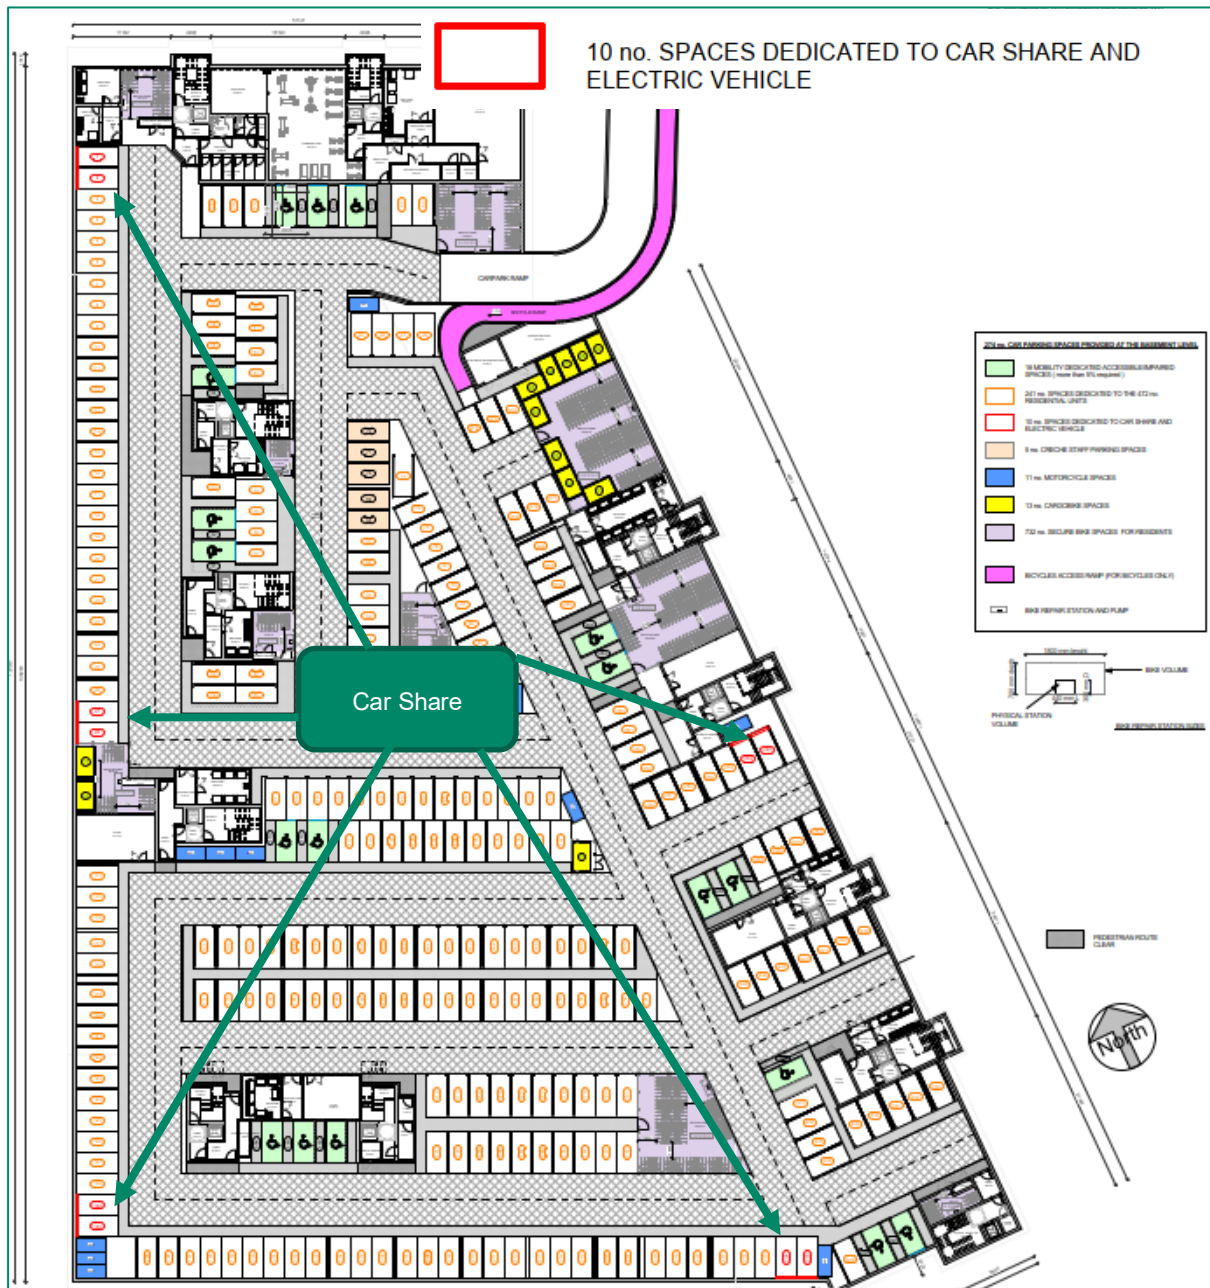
Car Share Basement Layout (Source: C+W O'Brien Architects Drawing No. 092035)
